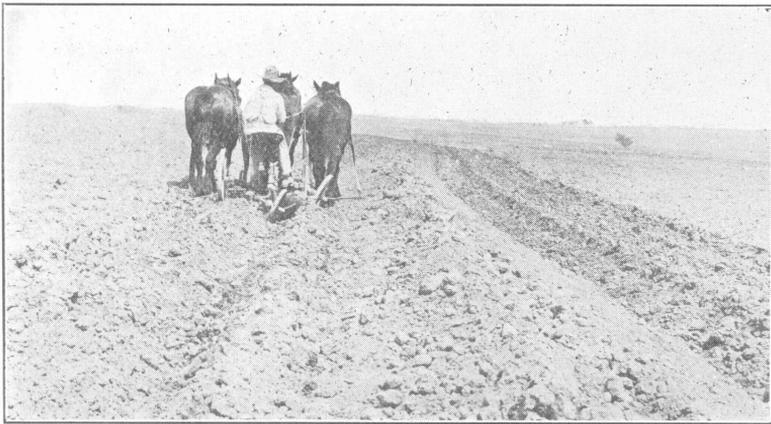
Building a terrace with plow and V-drag. One round has been made with the drag which shoves one furrow at a time about 4 feet towards the center of the terrace.
